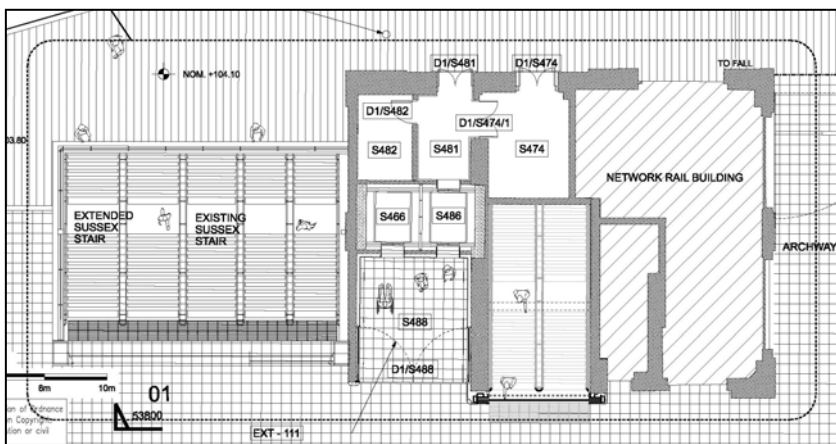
This drawing shows the South Ticket Hall Ground Level Plan, with detail below showing the planned lift shaft.
